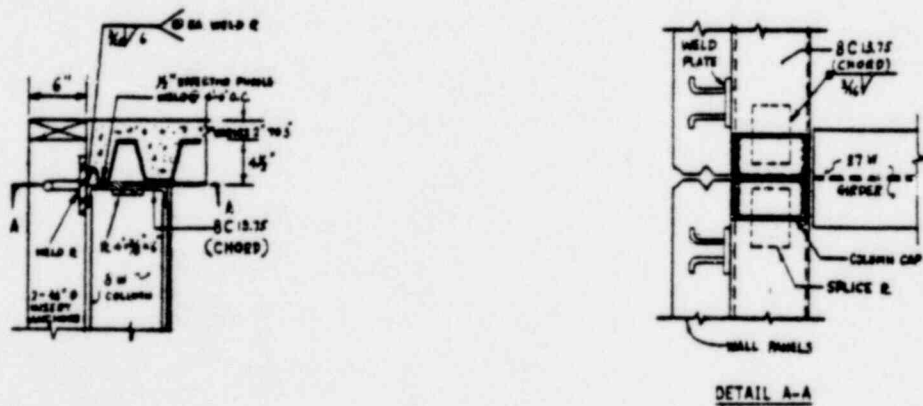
TYPICAL ROOF DIAPHRAGM CONNECTION AT WALLS
